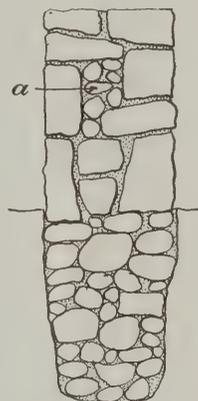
Incorrect Method of Building a Wall on a Trench Foundation.
